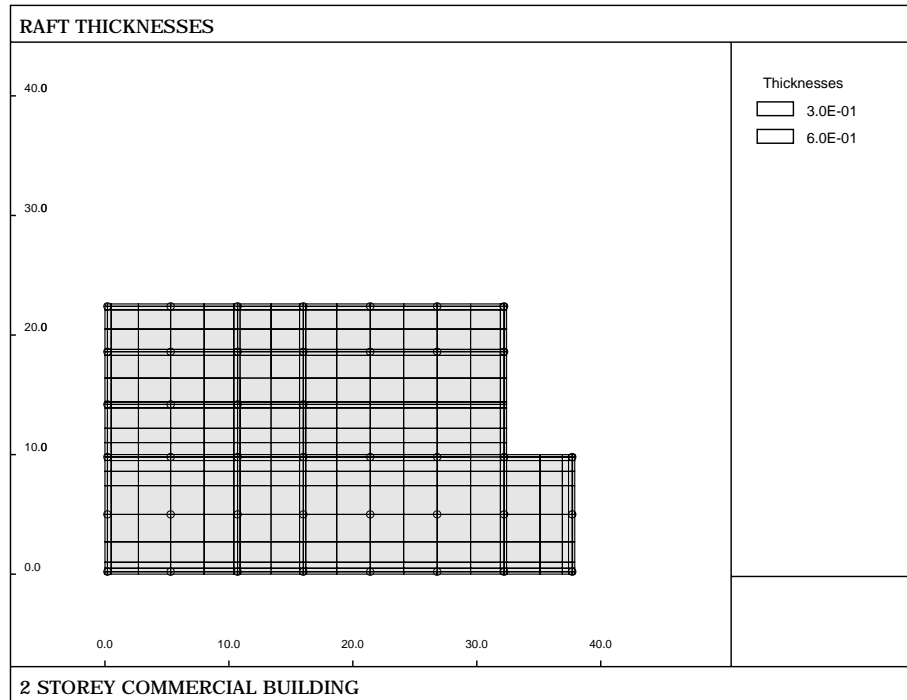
Finite Element Mesh with Stiff Elements at Location of Basement Wall.
